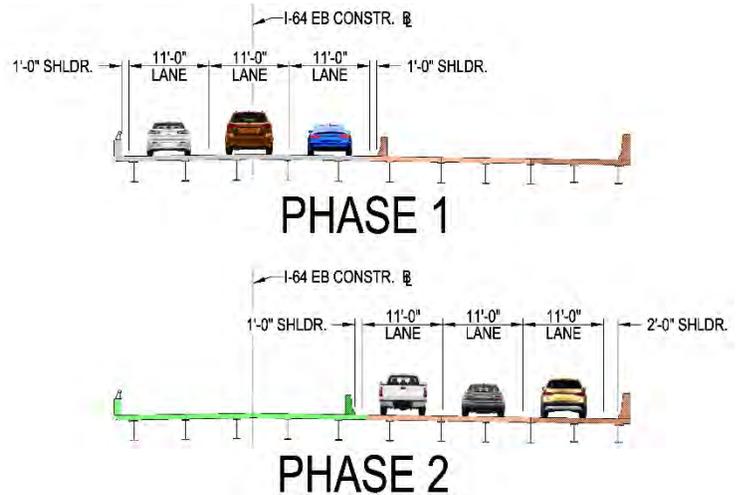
Outside and Inside Access at Tidewater Dr, I-64 EB
